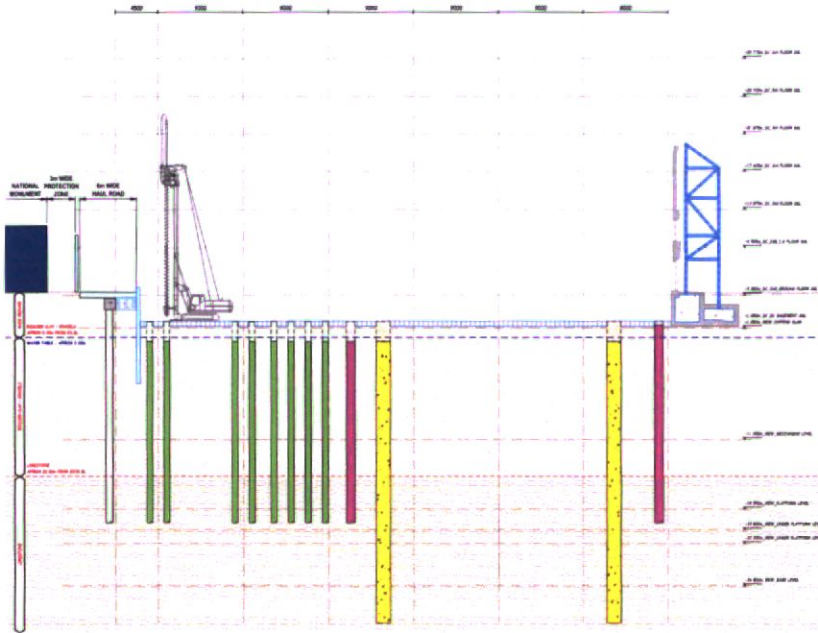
Phase 4 – Construct Diaphragm Walls to MEW and also continue oversite development foundation piling.
